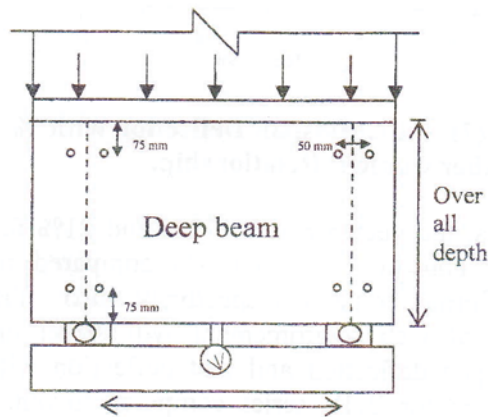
Test Setup and Arrangement of Demec Disc on Beam.
